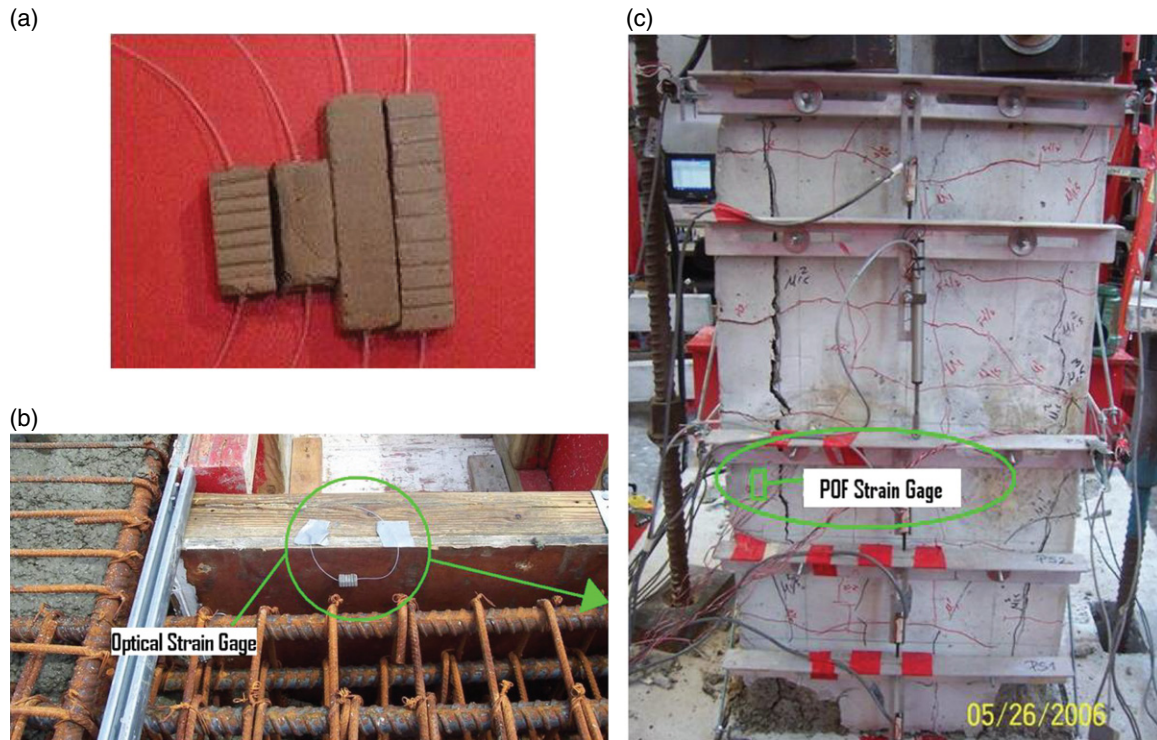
Embedding of single-mode PMMA POF in concrete structural component. (a) POFs embedded in pre-cast concrete blocks; (b) fixture of pre-cast block to frame for casting of the concrete structure; (c) concrete structure after failure. (Photographs courtesy of Omid Abdi.)
